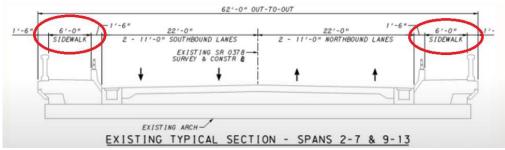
Existing Bridge Lane/Sidewalk Configuration (PennDOT)
